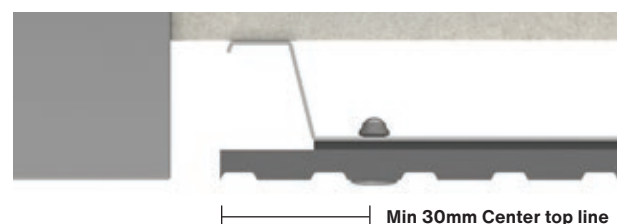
Swisspearl Patina Inline installation on cut to size board.
